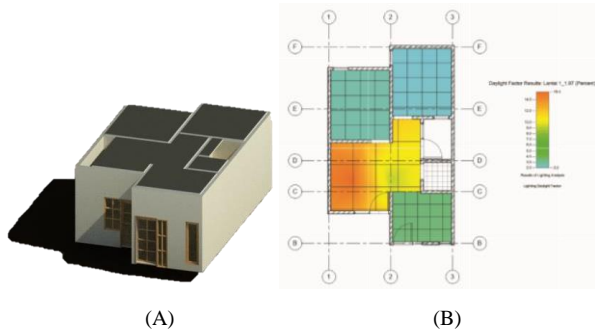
(A.) BIM Model of Design Modify of Medina Residence by adding skylight opening and backyard 1 (B.) Access Daylight Factor in modification of building plan on Medina Residence 1 Floor
